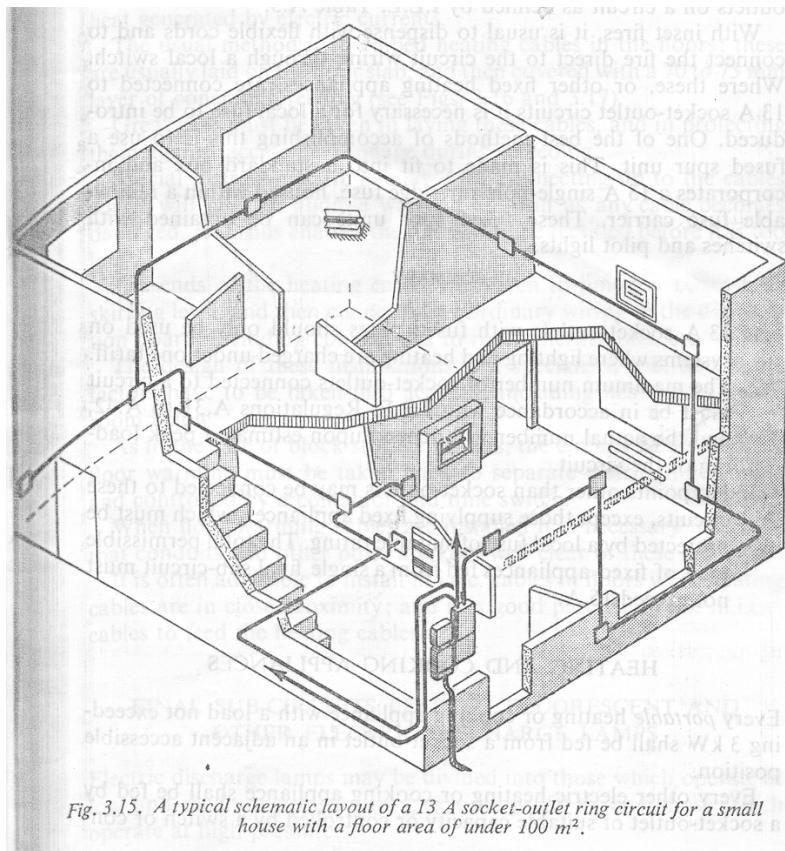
A typical schematic layout of a 13 A socket-outlet ring circuit for a small house with a floor area of under 100 m².
